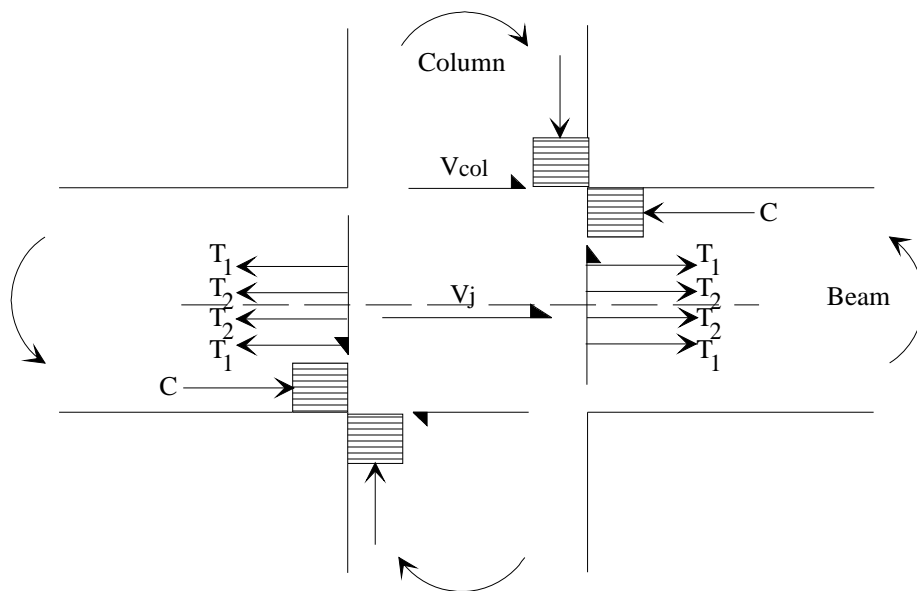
Forces Acting on the Joint of a Debonded Prestressed Moment-Resisting Frame
